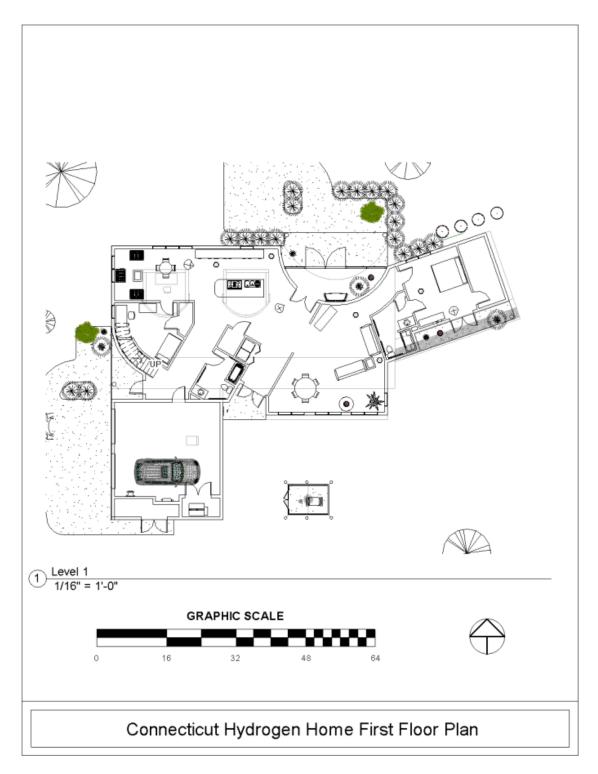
Figure I. New Hydrogen Home in Wallingford, CT First Floor Plan
